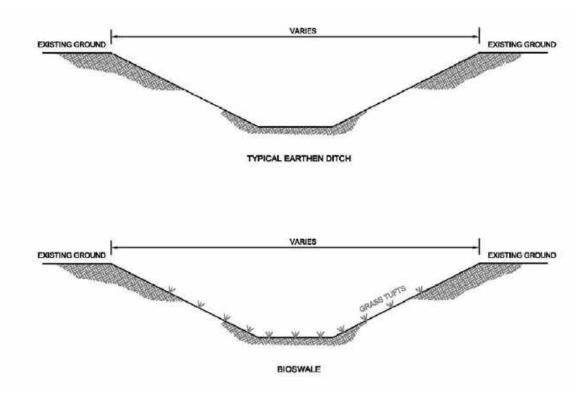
Cross-section of typical earthen ditch (top) and bioswale (bottom)
